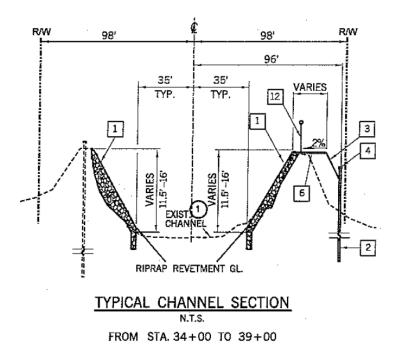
The south side has sheetpile installed that would reduce the likelihood of failure. This is with project
